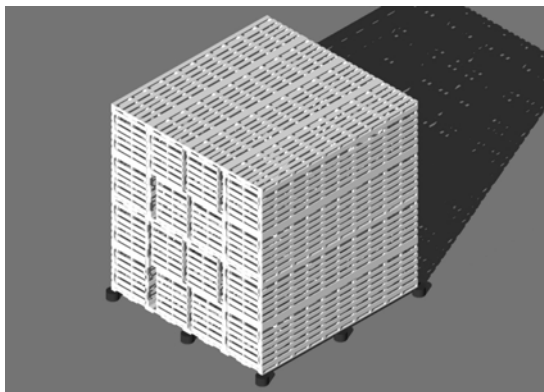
Rough 3D model of PHS© timber frame. The frame structure consists of Euro-pallet or US stringer boards, applicable in several contexts as roof, floors and wall framing and embraced mainly by plywood boards, tensile structures, etc. Source: Suau.
